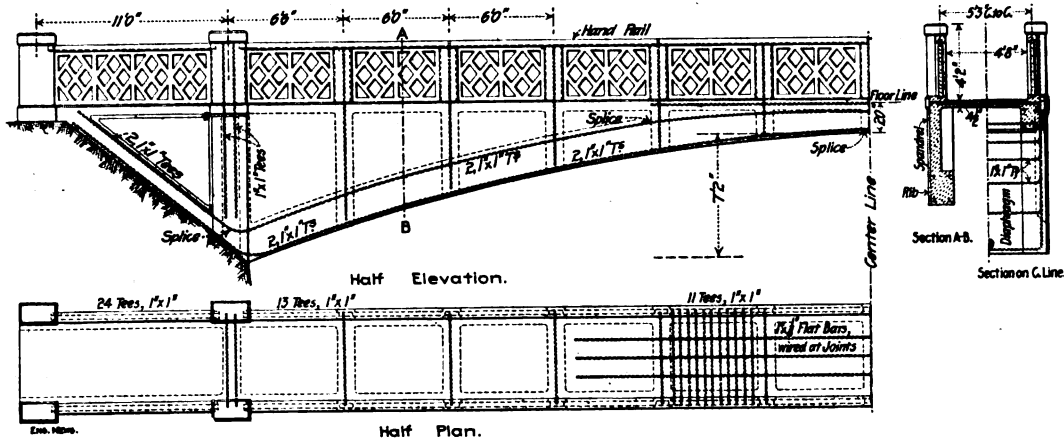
HALF PLAN AND ELEVATION AND TRANSVERSE SECTION OF REINFORCED CONCRETE RIBBED ARCH BRIDGE, DEER PARK, LA SALLE, ILL.
